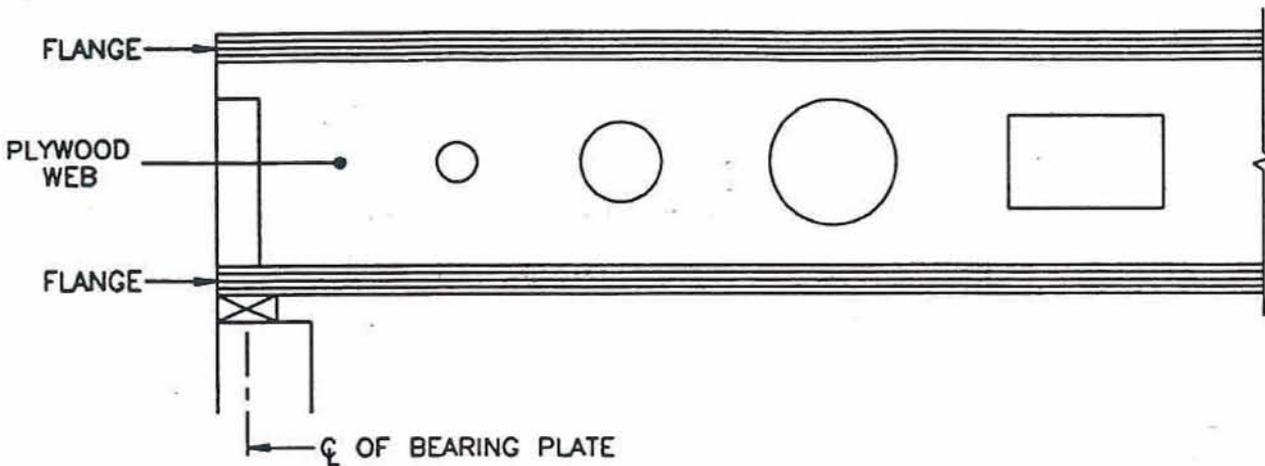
WEB STIFFENER NOTES AND DETAILS
